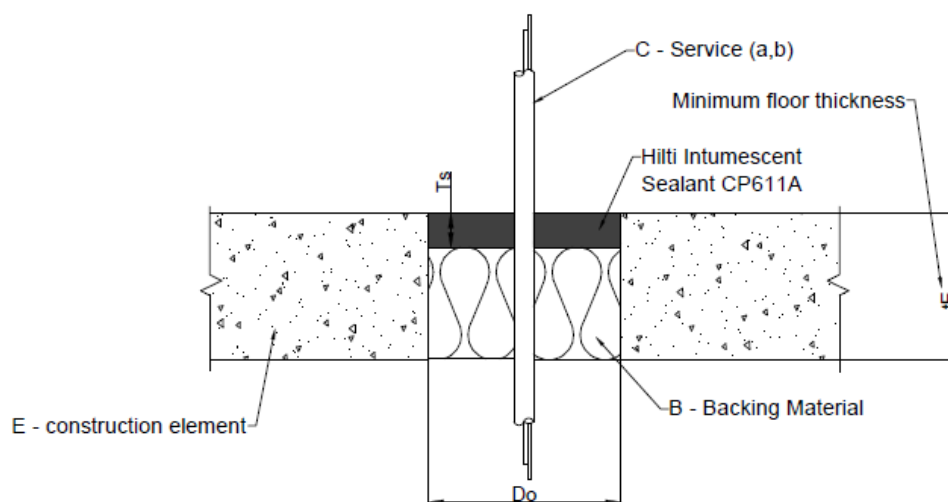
Side View, seal type 18, Steel and uPVC Conduits or tubes $\leq 16\text{mm}$ OD in concrete floor, CP611a
